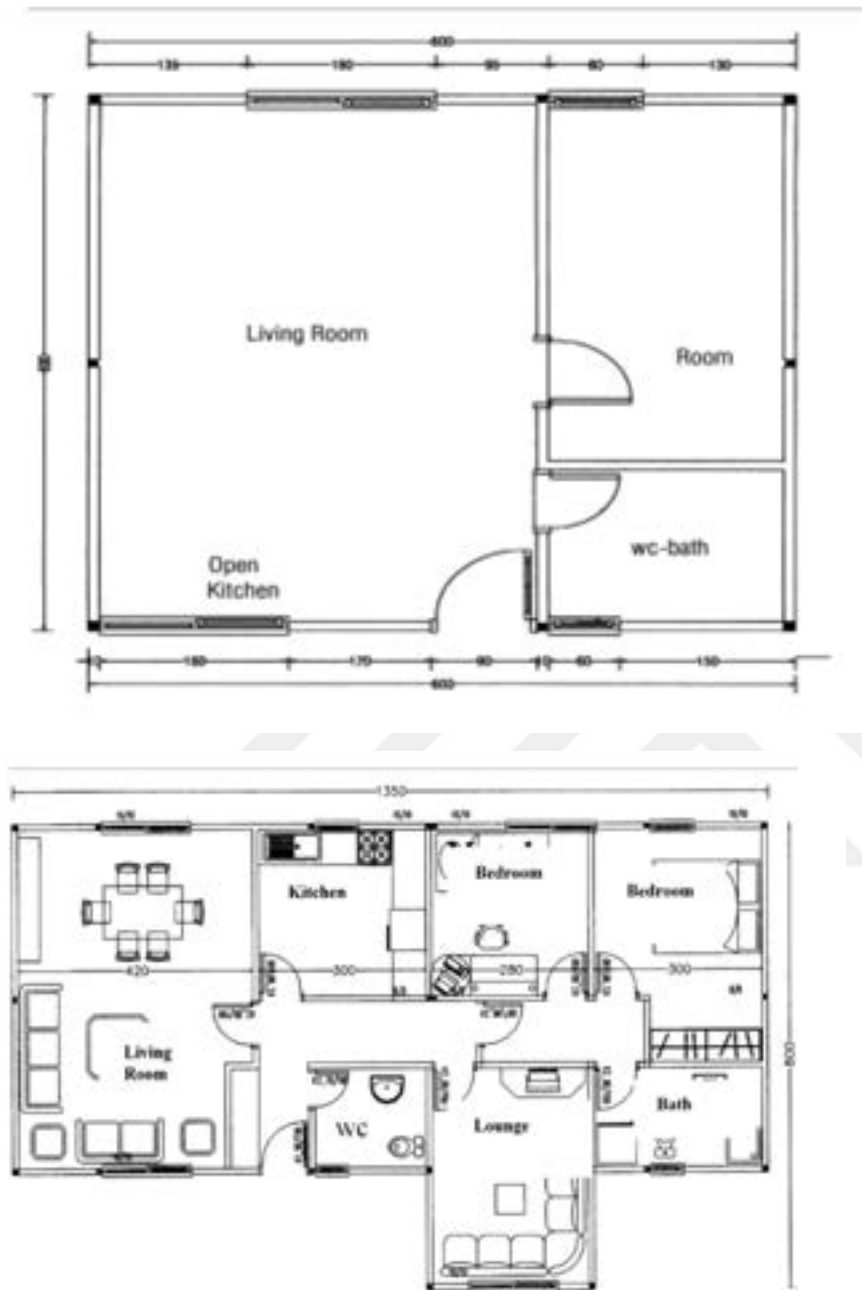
New permanent house formed from two temporary houses and some additional parts. (Arslan, 2007)
